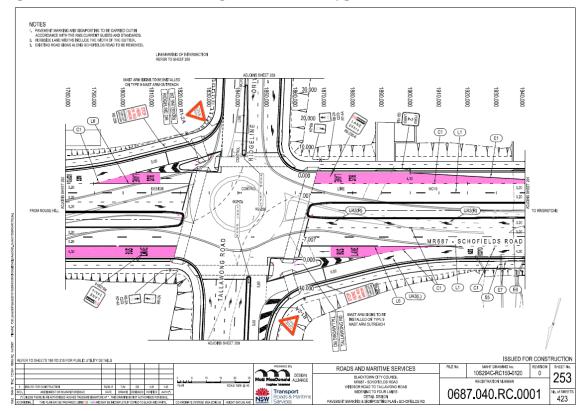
Schofields Road/Tallawong Road Intersection Upgrade
